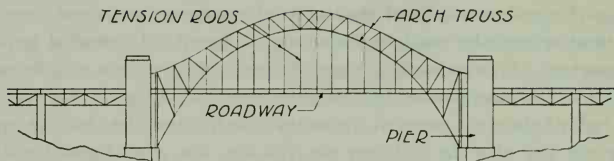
Bridge carried by a steel truss in the form of an arch.
